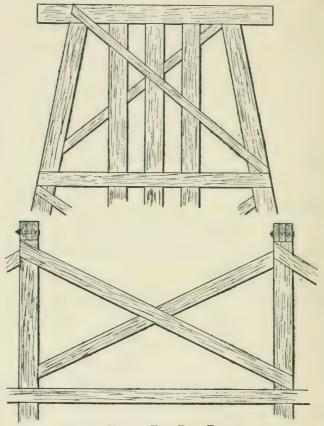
TOP OF FIVE-PILE TRESTLE: SIDE ELEVATION AND CROSS SECTION. Scale $\frac{3}{16}$ inch = 1 foot.
